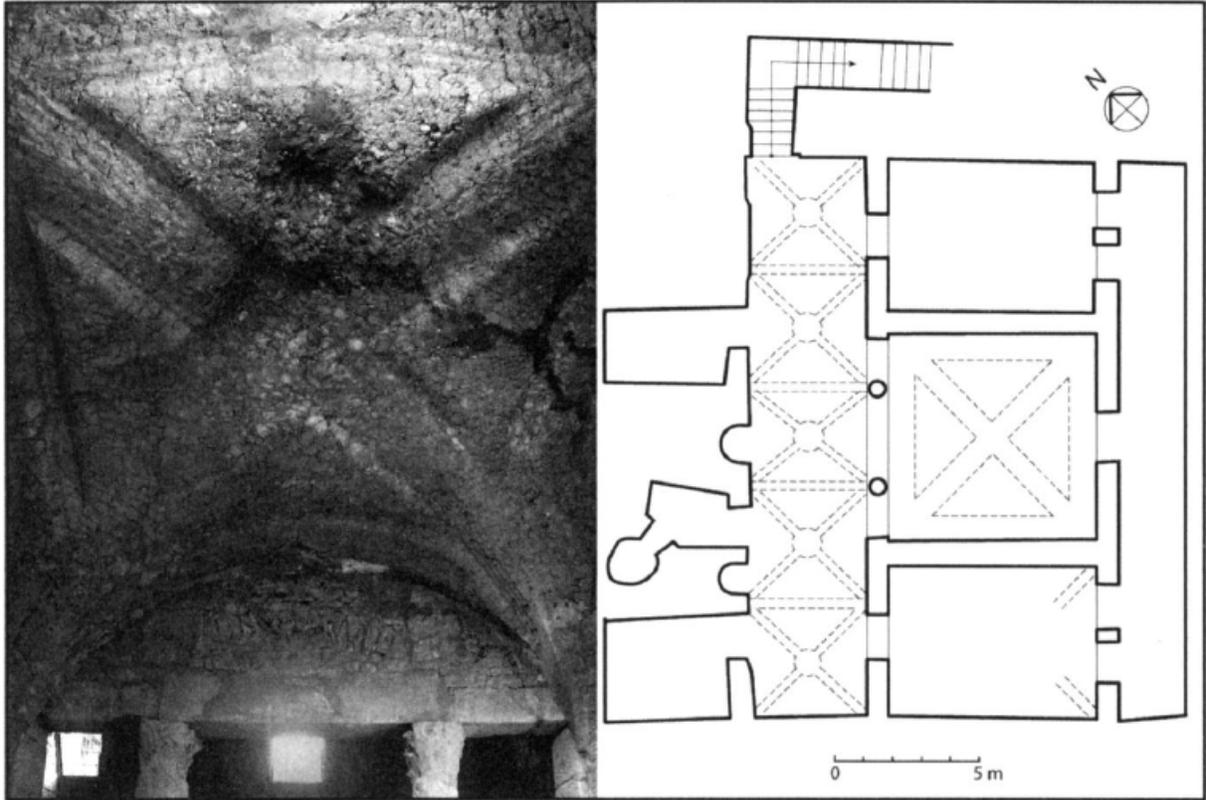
House of Amphitrite, Bulla Regia, Tunisia. Vault with impressions of fallen vaulting tubes; plan of underground level ceilings, with vault patterns indicated.
